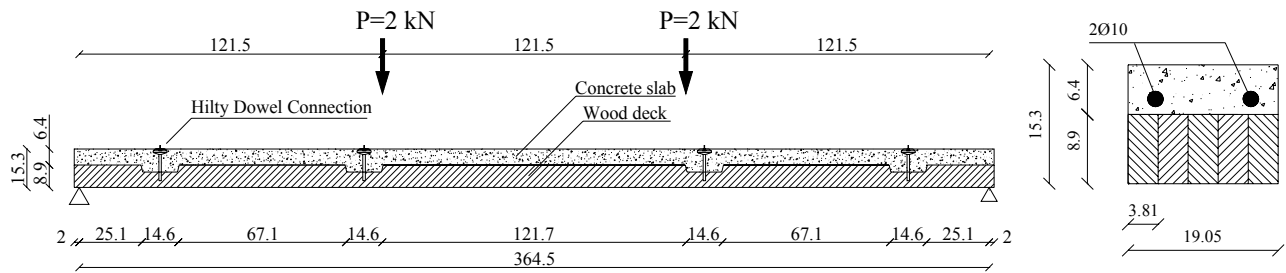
Longitudinal view (left) and cross-section (right) of the composite beam (measures in cm)
